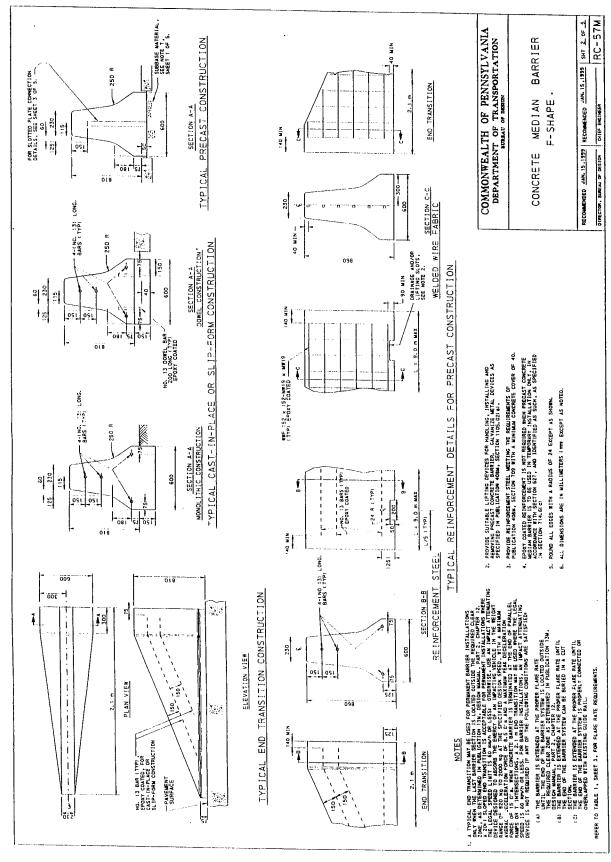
Detailed drawing of concrete median barrier F-shape (2 of 5).
